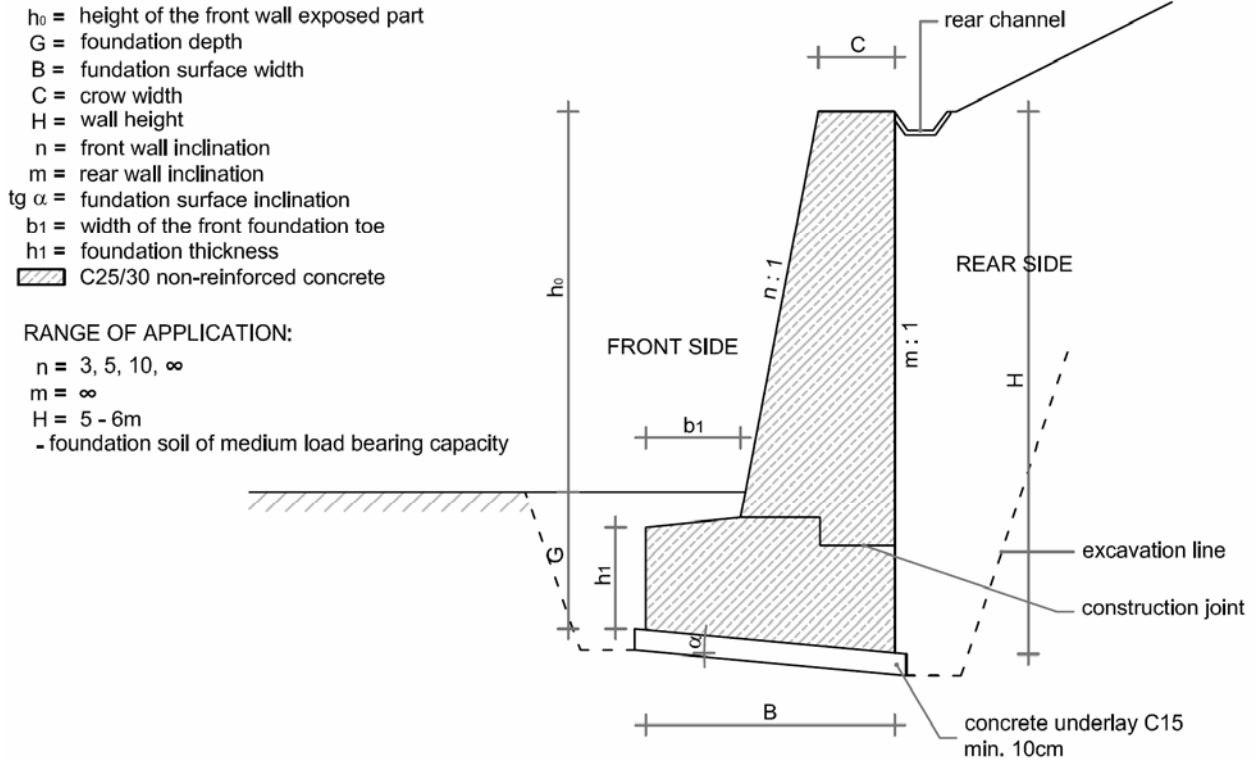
Concrete gravity retaining wall with a vertical rear wall
